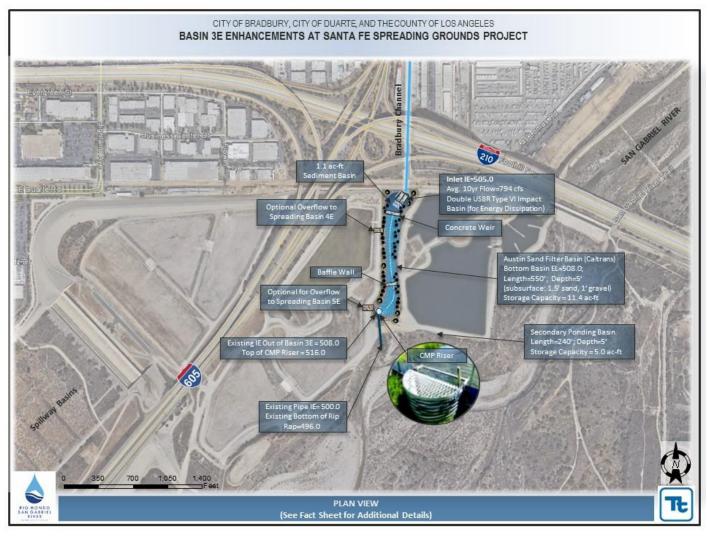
Basin 3E Enhancements at Santa Fe Spreading Grounds Site Layout
